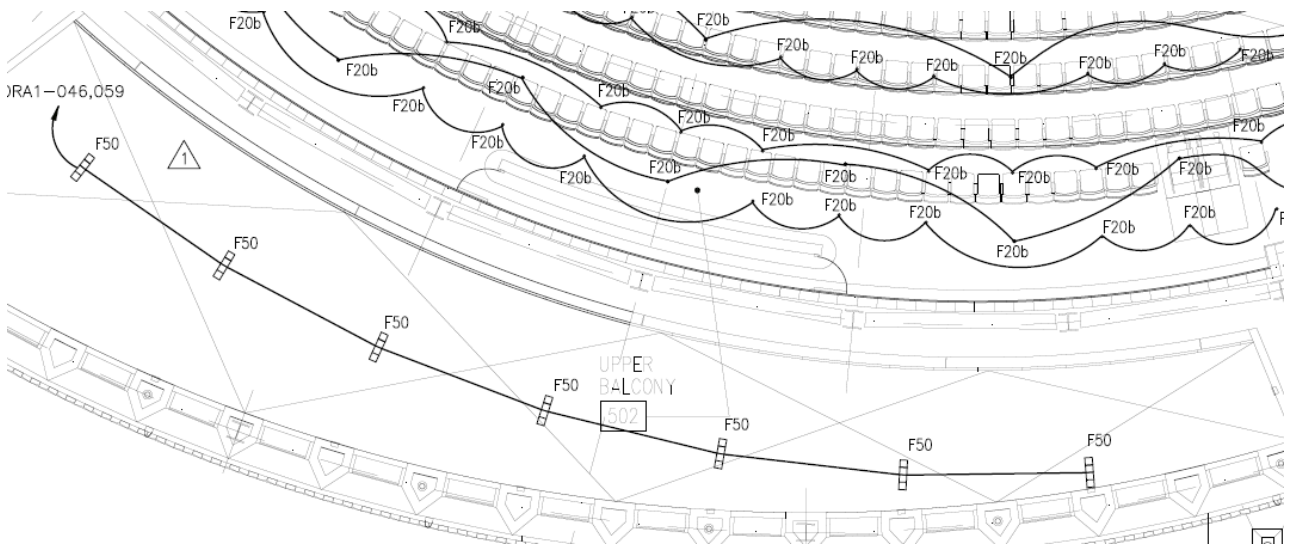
Upper Lobby Level 05 Floor Plan
